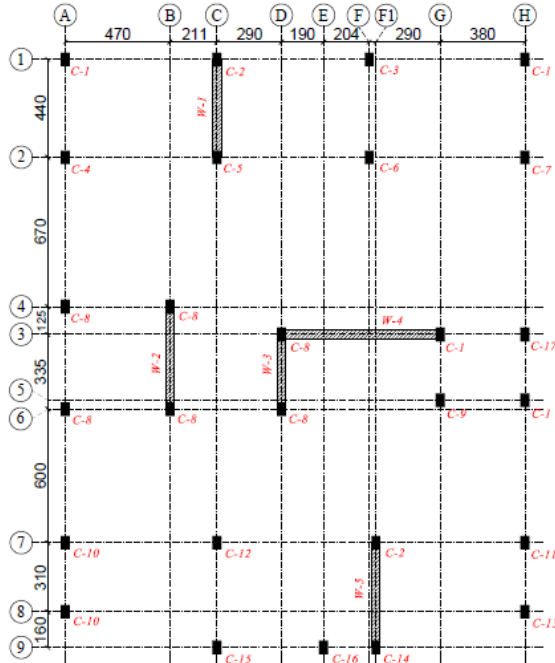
The plan of the existing building and labeling of columns and shear walls
